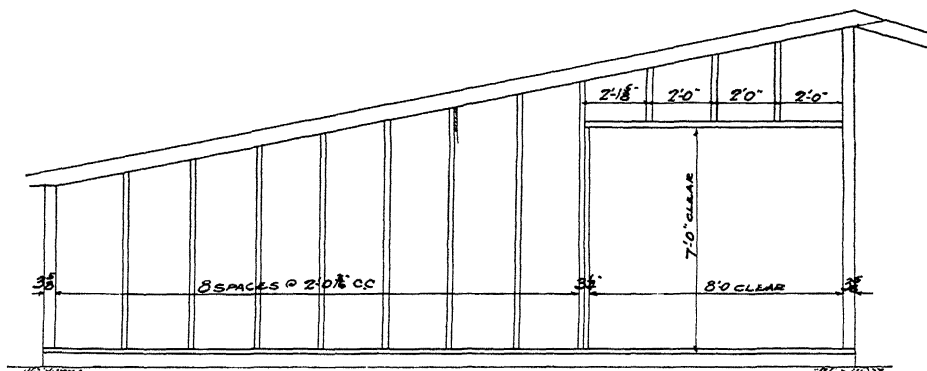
End framing plan. Width 25 feet out to out of studs. This illustration shows the hood which projects over the front of building, to keep rain and snow from entering thru lattice and windows.
